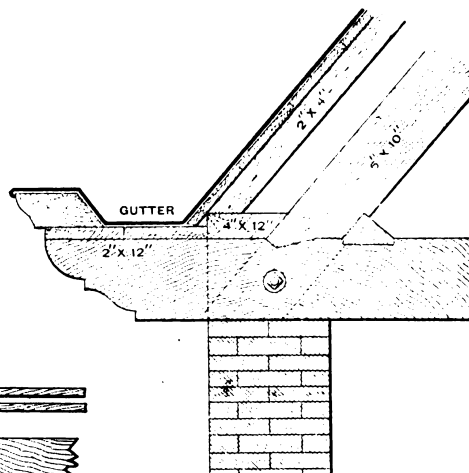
Section through Cornice and Gutter.—Scale, $\frac{1}{4}$ Inch to the Foot.
